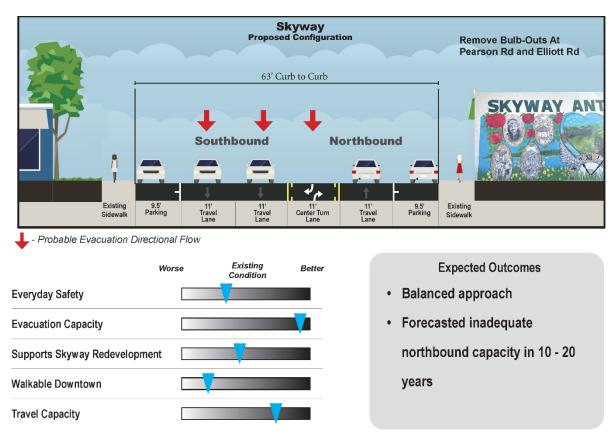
Reconfiguration of Skyway between Elliott Road and Pearson Road
